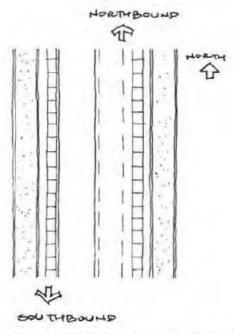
Quebec Street: 1st Avenue to Pacific Boulevard – West Side Running Streetcar Option
